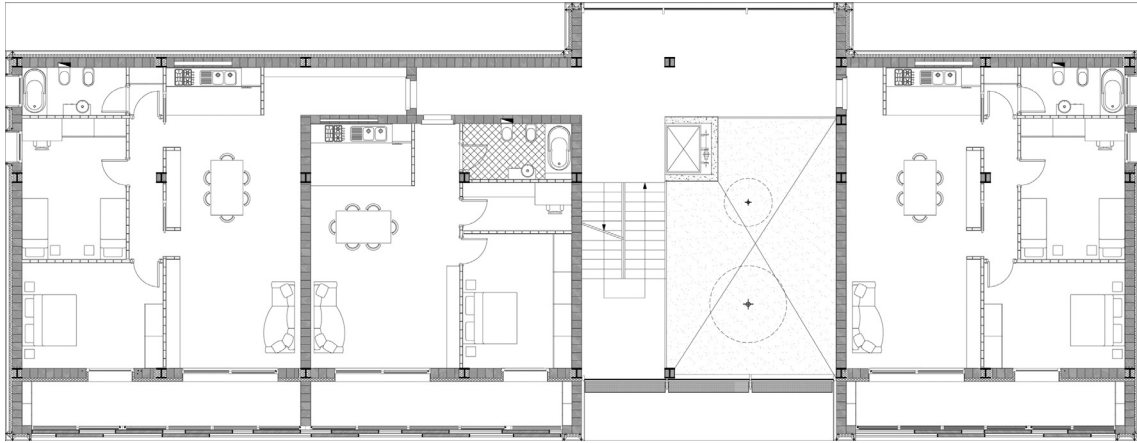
Planimetry of the apartments characterizing every floor of the building.
